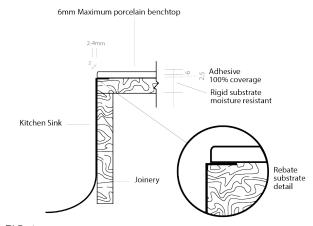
REBATED UNDER MOUNTED SINK DETAIL
